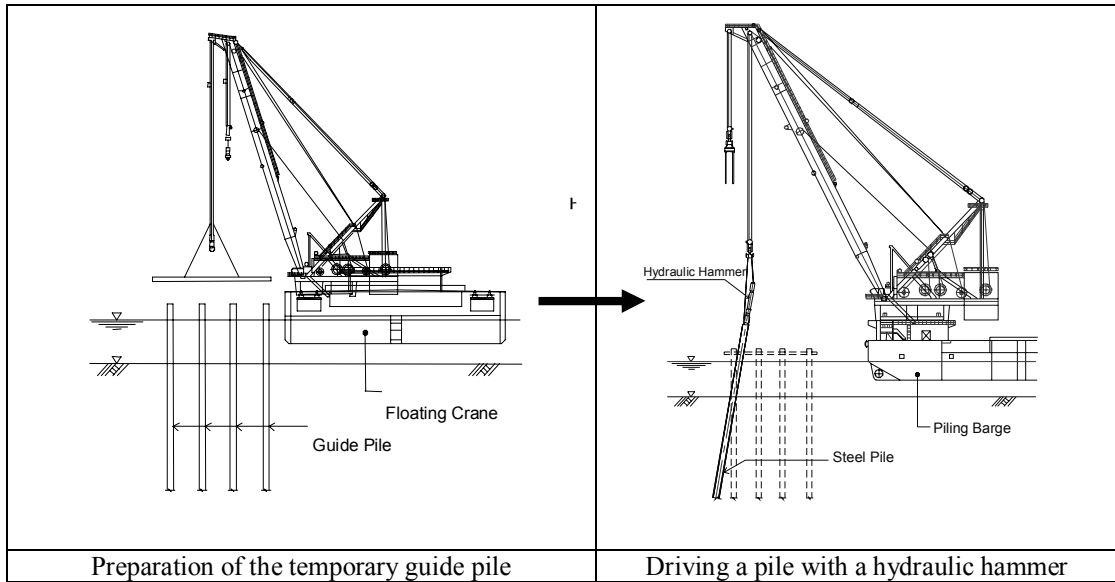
Construction of the Pile Foundation with Piling Barge
